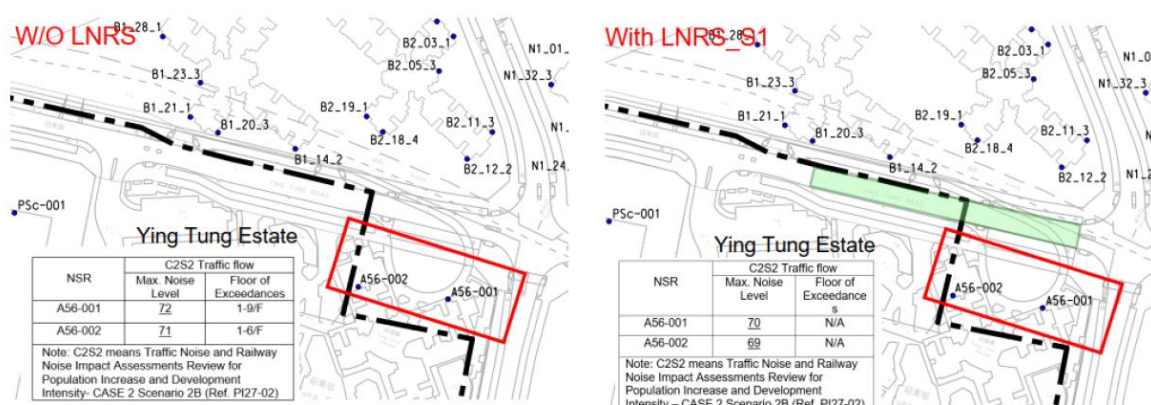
Locations and extents of the proposed LNRS at Ying Tung Road (Road L5)
